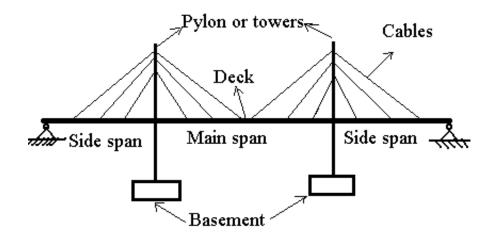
Stay Cable Bridge (Vannemreddi 2010)
